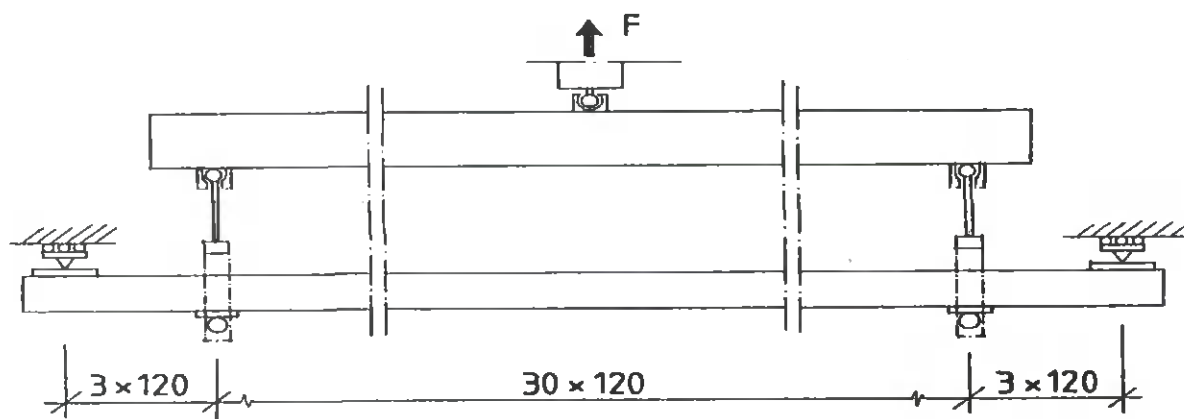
Principal test arrangement when timber members containing many weak zones were tested. All sizes in mm.
